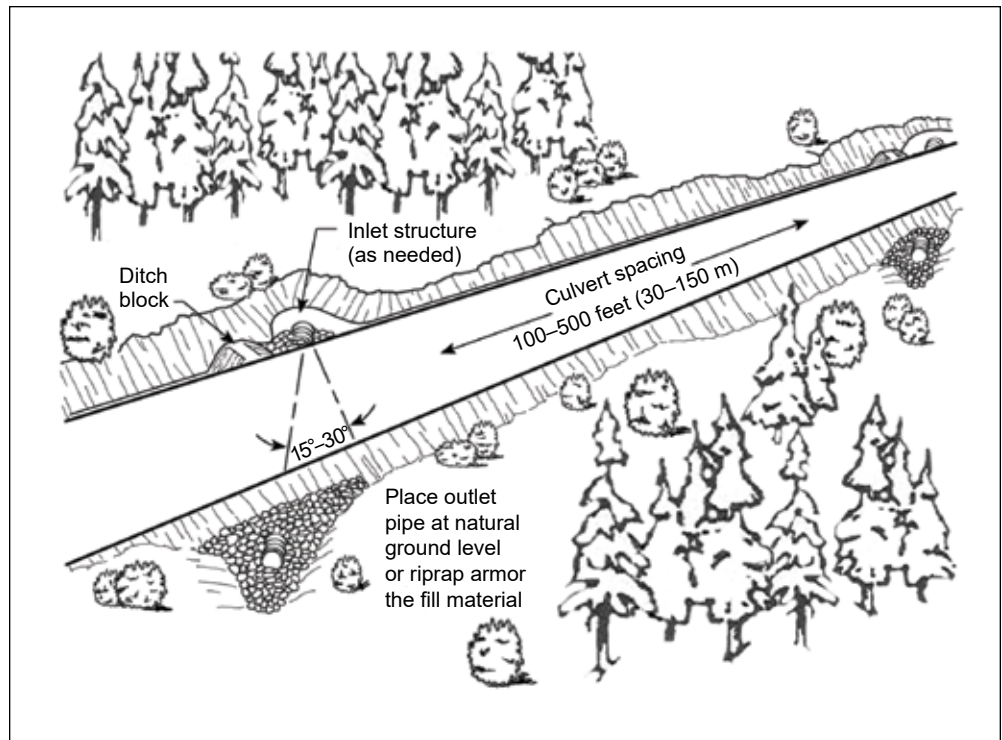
A typical culvert cross-drain installation. (Figure from Keller et al. [2011])
